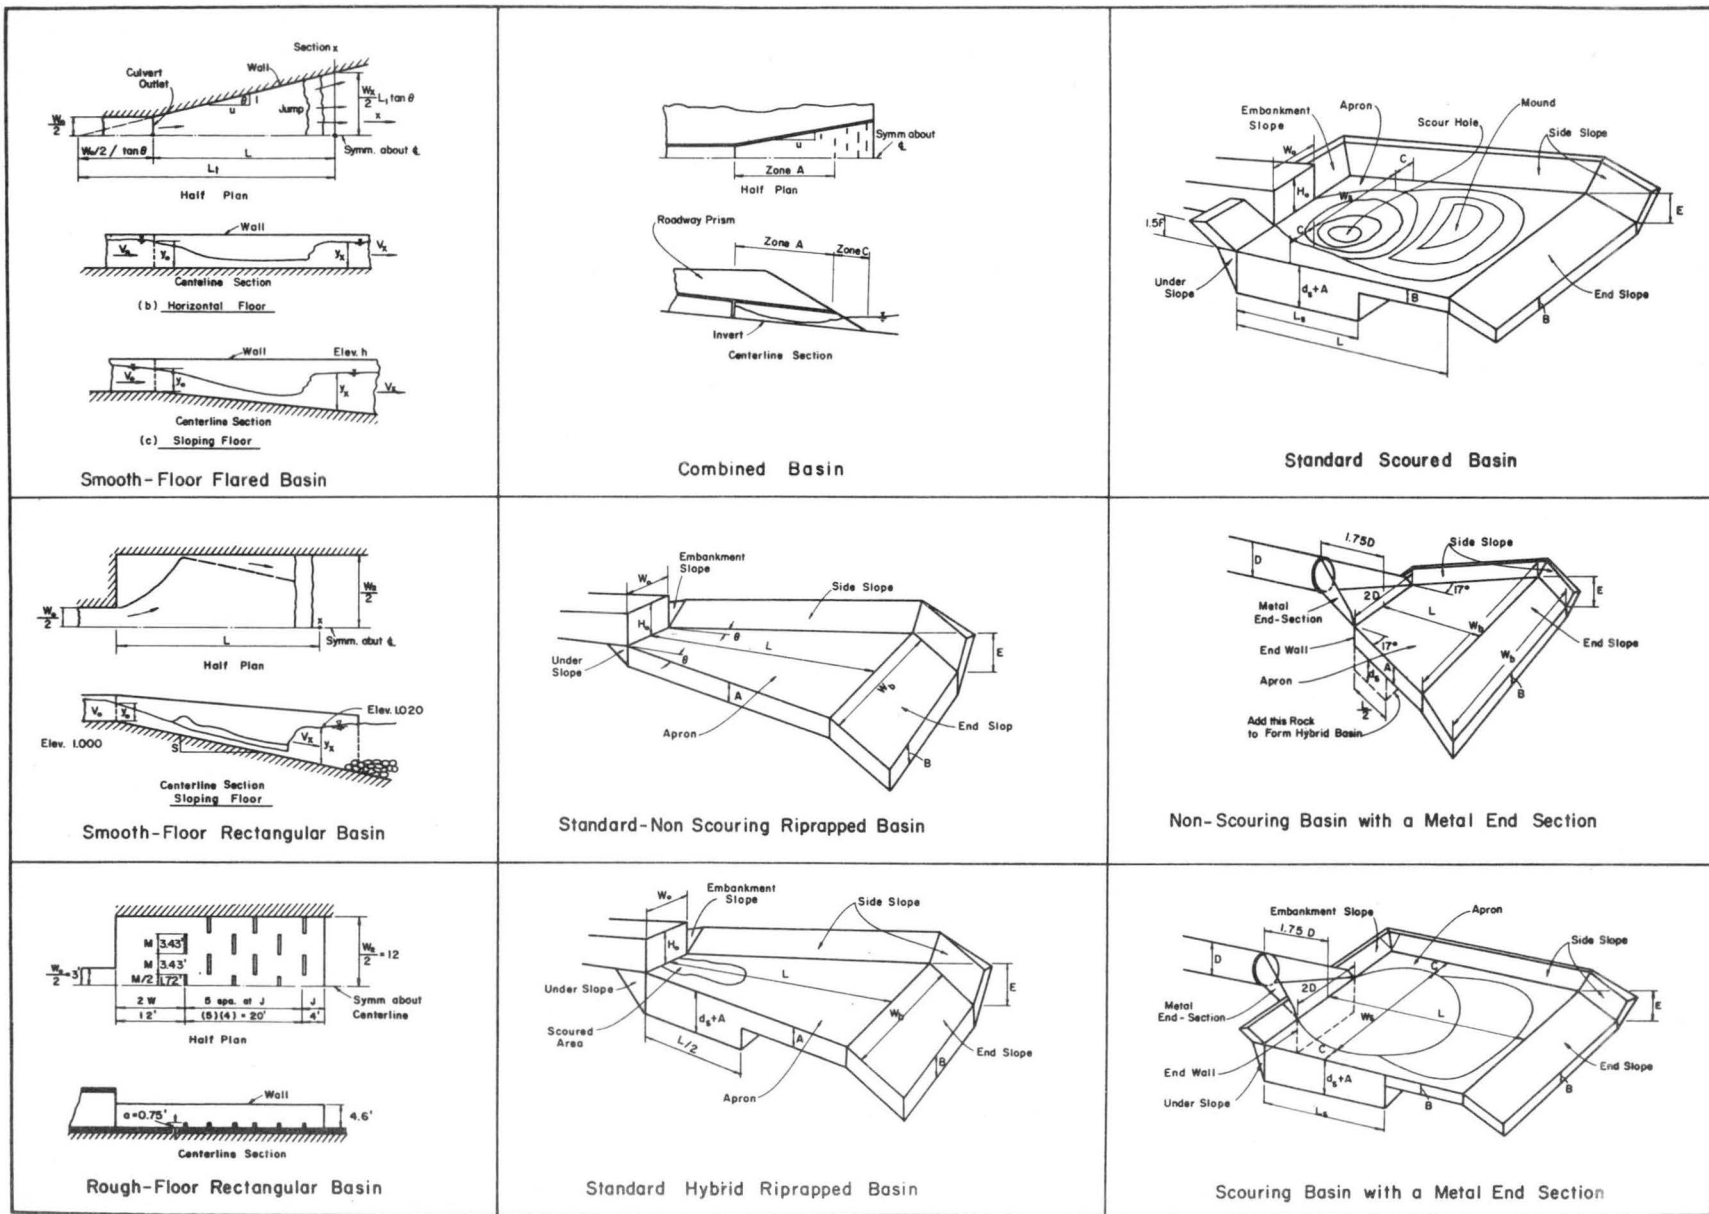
Rigid and Riprapped Culvert Outlet Basins
